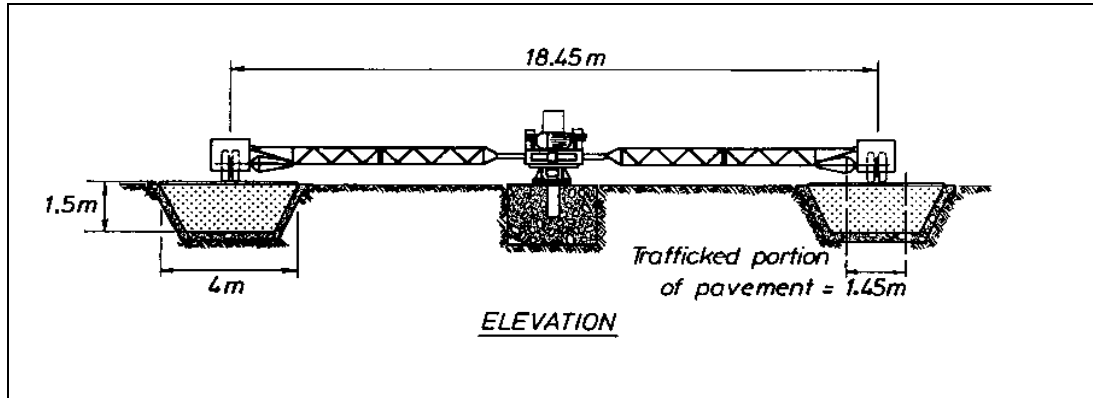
Elevation view of the CAPTIF testing equipment.
